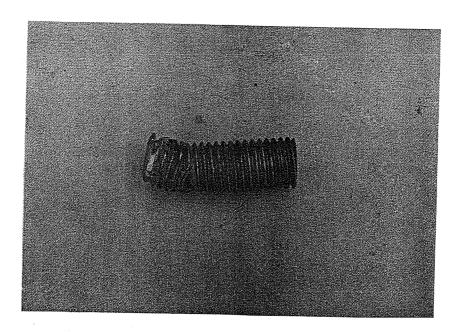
Top portion of failed anchor bolt - Test CN3h-WN
